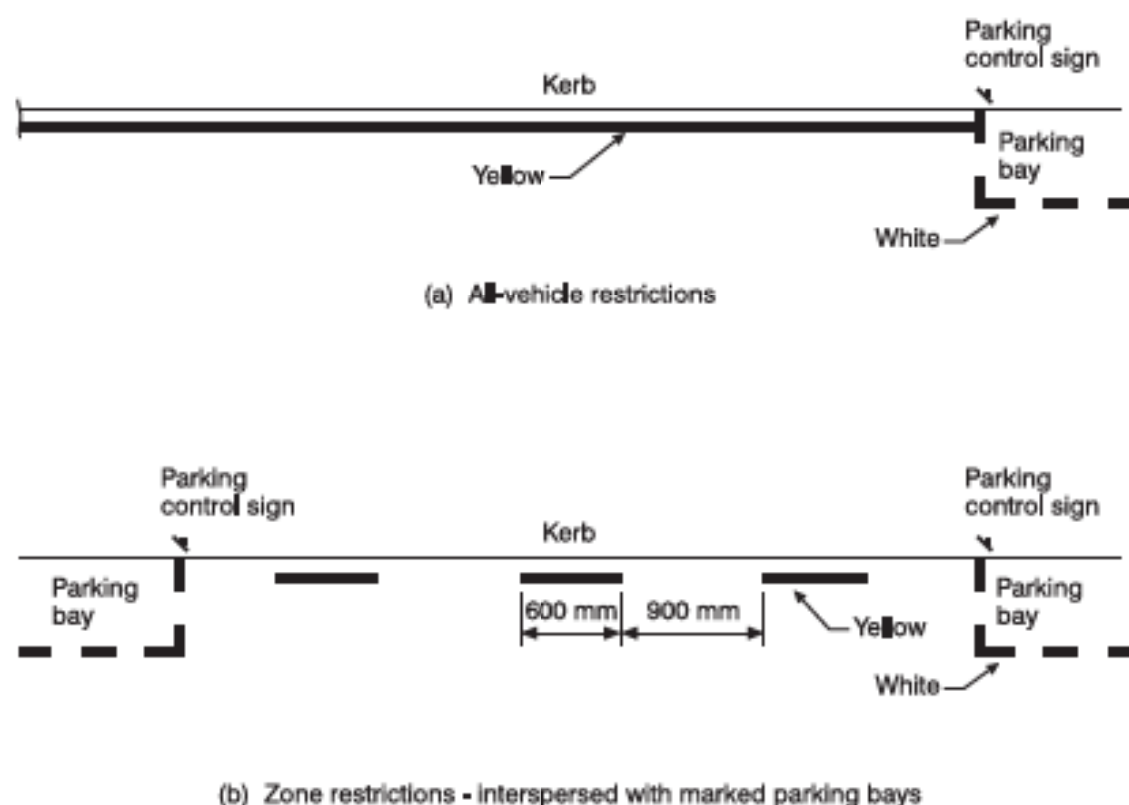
TYPICAL LAYOUTS FOR FULL-TIME, PART-TIME OR ZONE PARKING RESTRICTIONS
